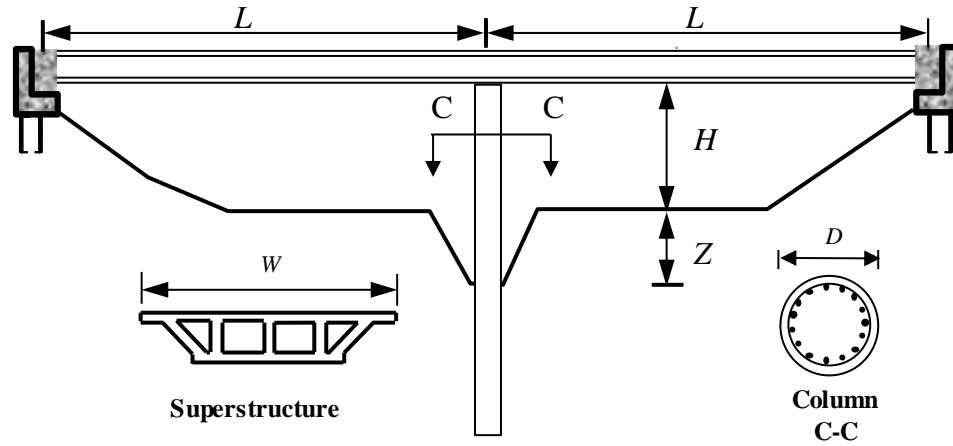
Elevation and cross-sectional view for the case study bridge piers (elevation of a typical bridge pier and cross-section)
